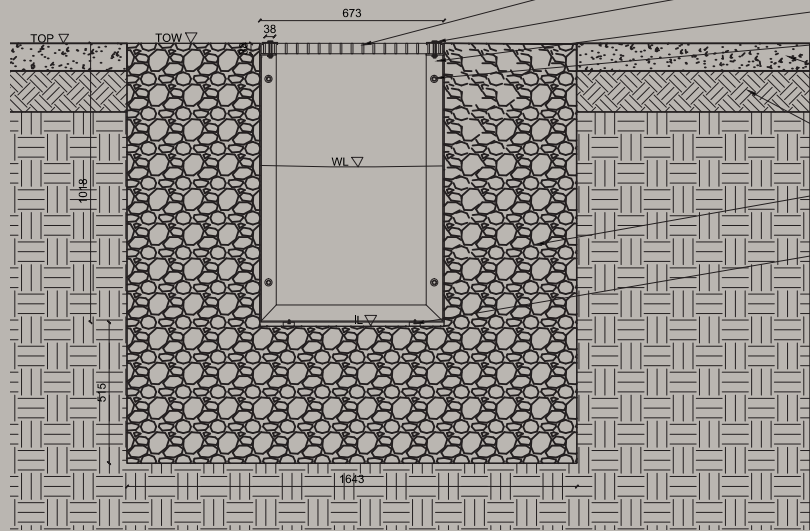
Detail Section (1:20) of Historic Water Channel with Fibre Glass Grating Fixing Detail (Author, 2014).
